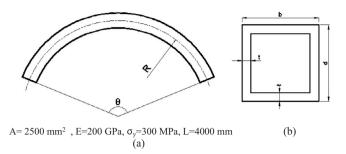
Geometry, Properties, and Section Details of the Curved Beam (a):Plan view of the curved beam; (b):Cross section of the beam.
